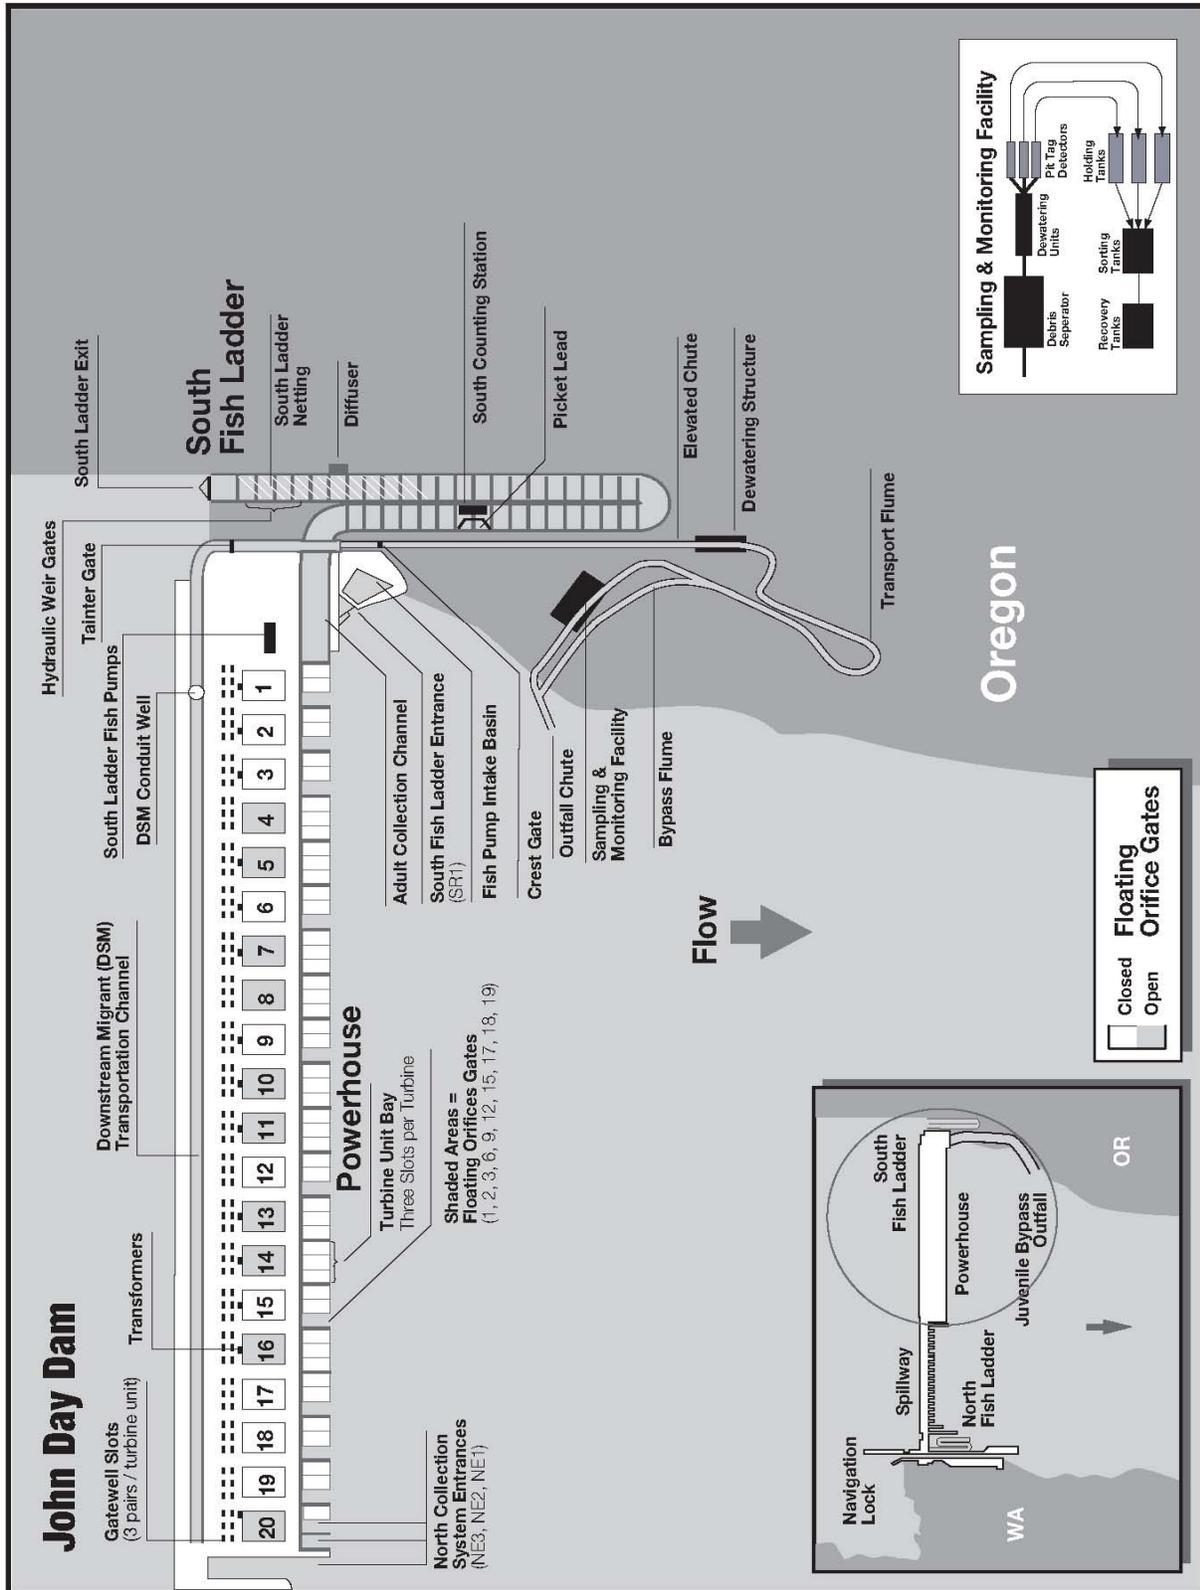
John Day south fish ladder, powerhouse collection system, and juvenile fish bypass system.
